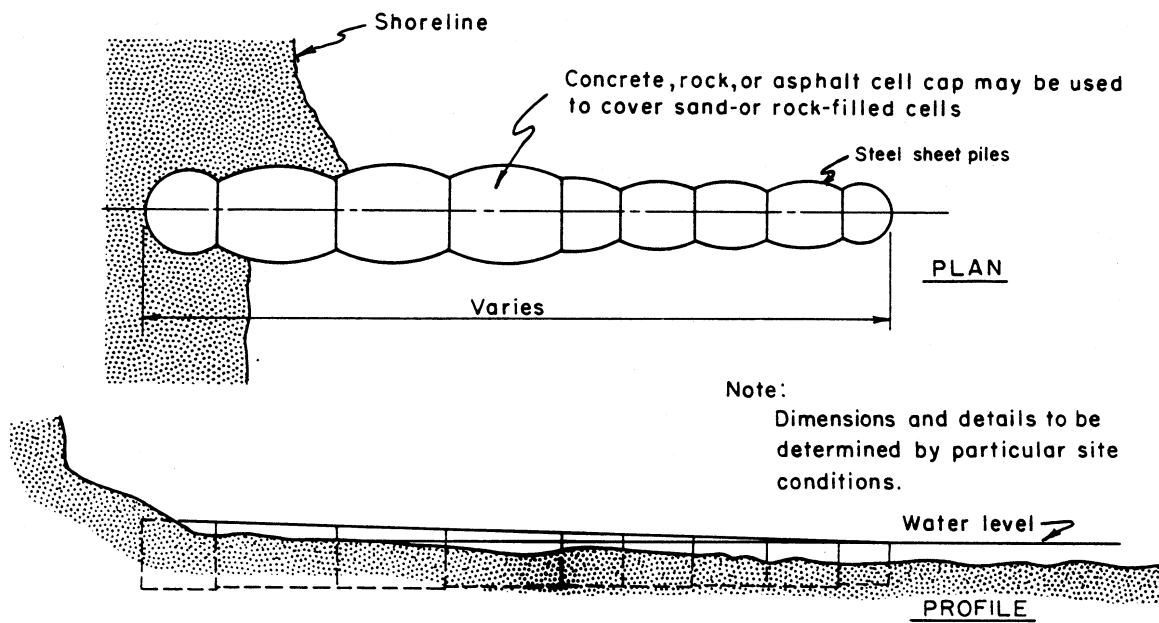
Cellular-steel sheet-pile groin, Presque Isle, Pennsylvania
